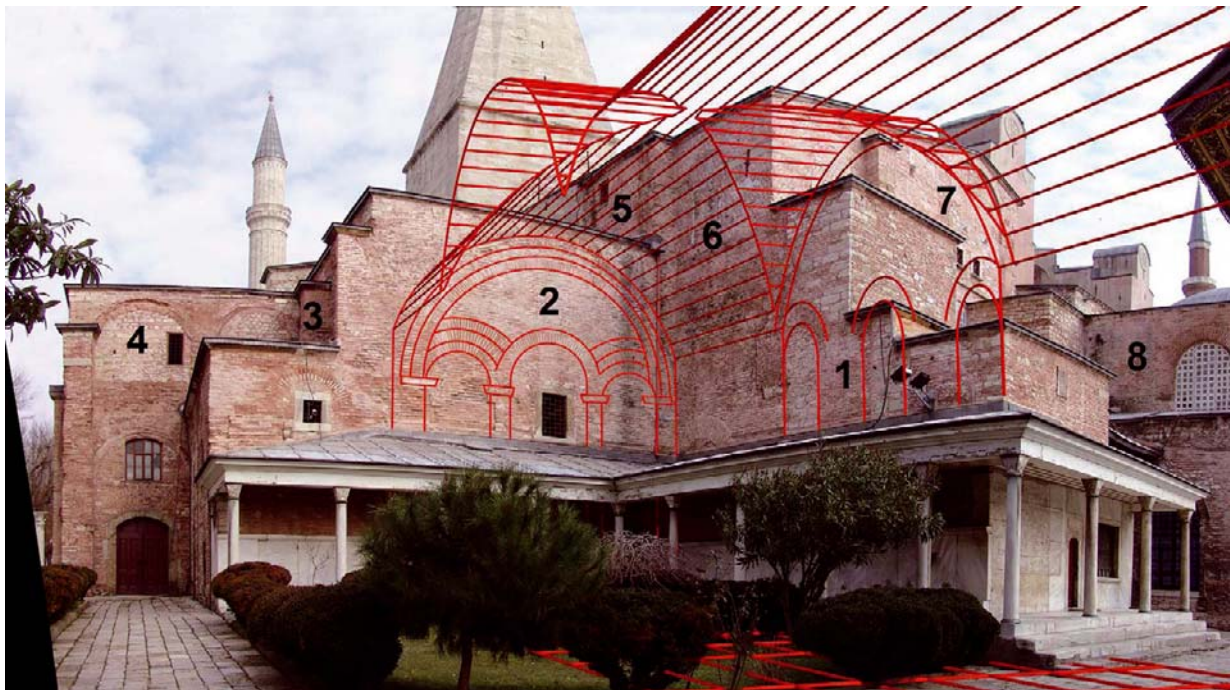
South-west corner of the church with a partial reconstruction of the Large Hall of the Patriarchate, view from south-west: 1 – east wall of the Large Hall, 2 – north wall of the Large Hall (antechamber behind it), 3 – two stories of small rooms north of the Large Hall, 4 – long room above the south atrium wing, 5 – west wall of the middle room on the west side of the hall above the south-west vestibule of the church, 6 – blocked door in the south room on the west side of the hall above the south-west vestibule, 7 – rooms above the south-west vestibule and on the top of the south-west ramp, 8 – baptistery.
